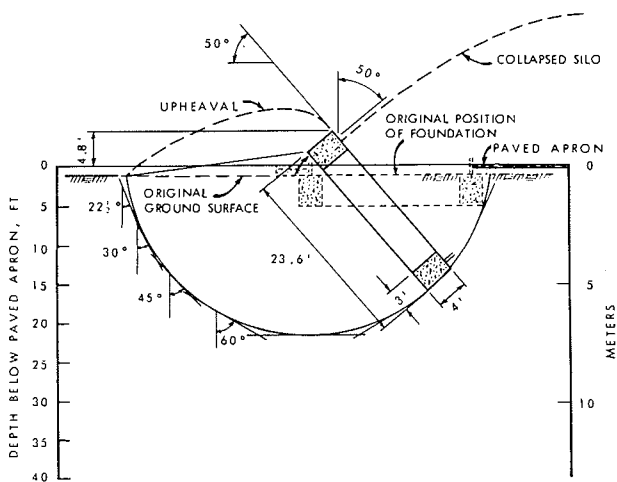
ATTITUDE OF SILO FOUNDATION AFTER FAILURE
